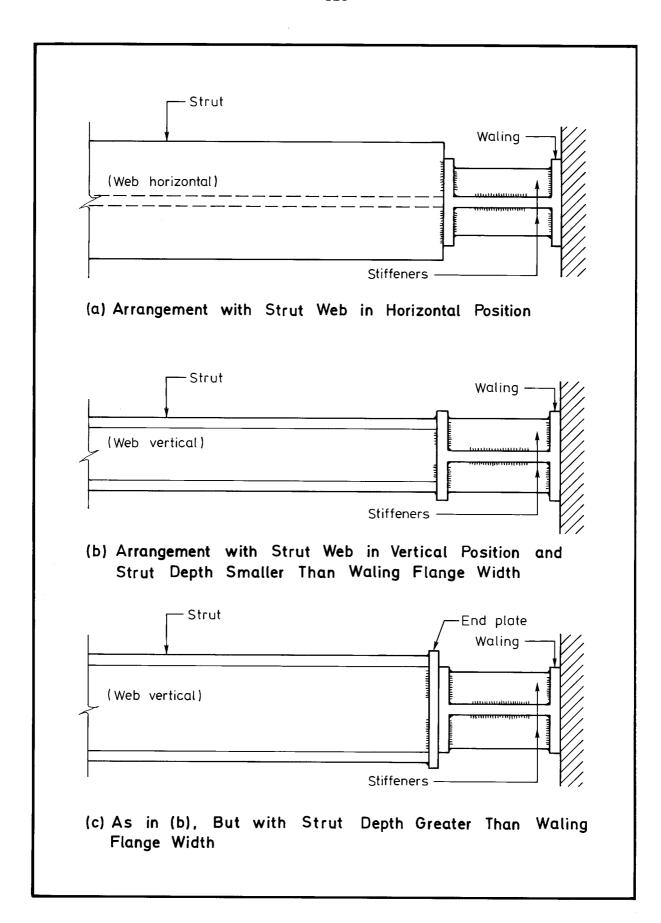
Typical Connection Details for Horizontal Struts (Goldberg et al, 1976)
